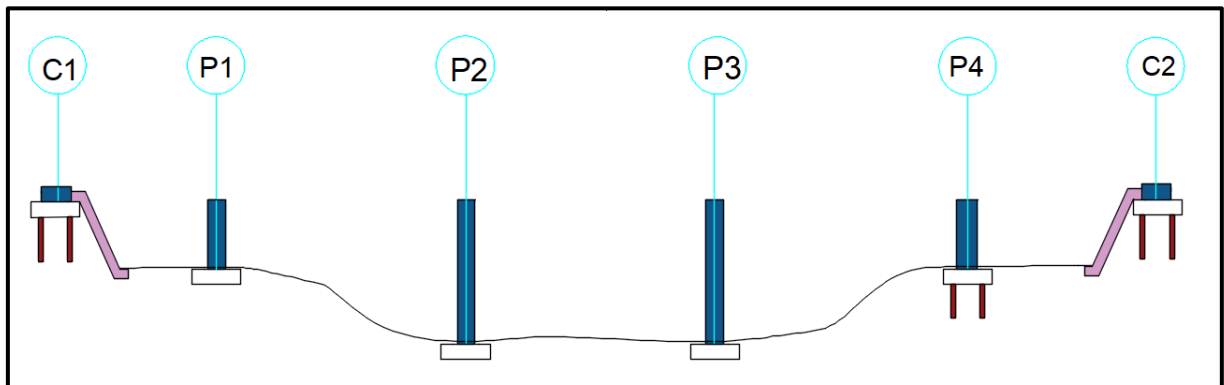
Sub-Structure Layout: Piers and Abutments Configuration
